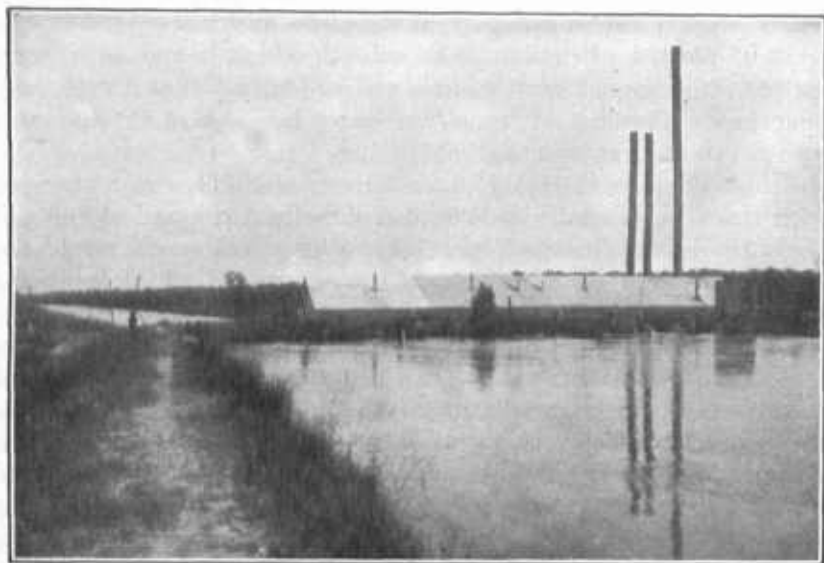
An irrigation canal and pumping plant, the second lift on the Neches Canal, Beaumont, Tex.
